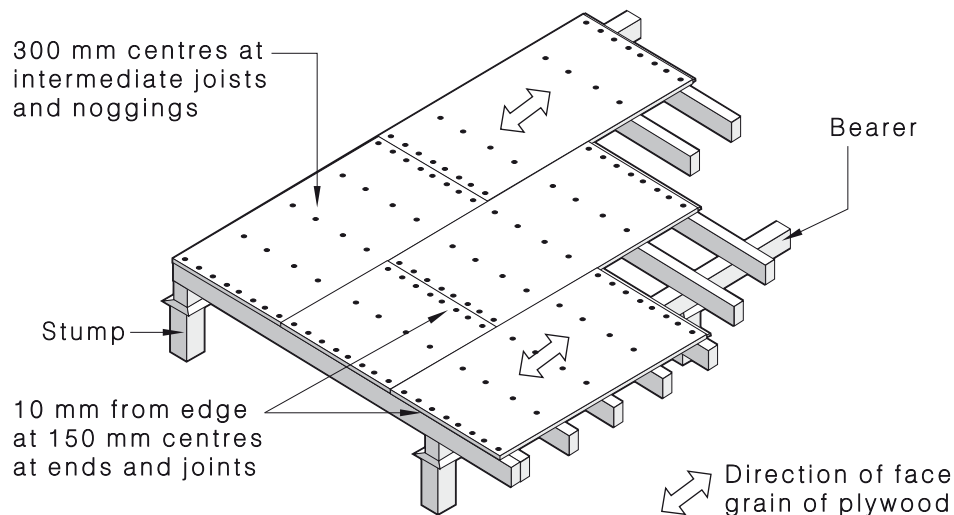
FIXING OF PLYWOOD SHEET FLOORING
